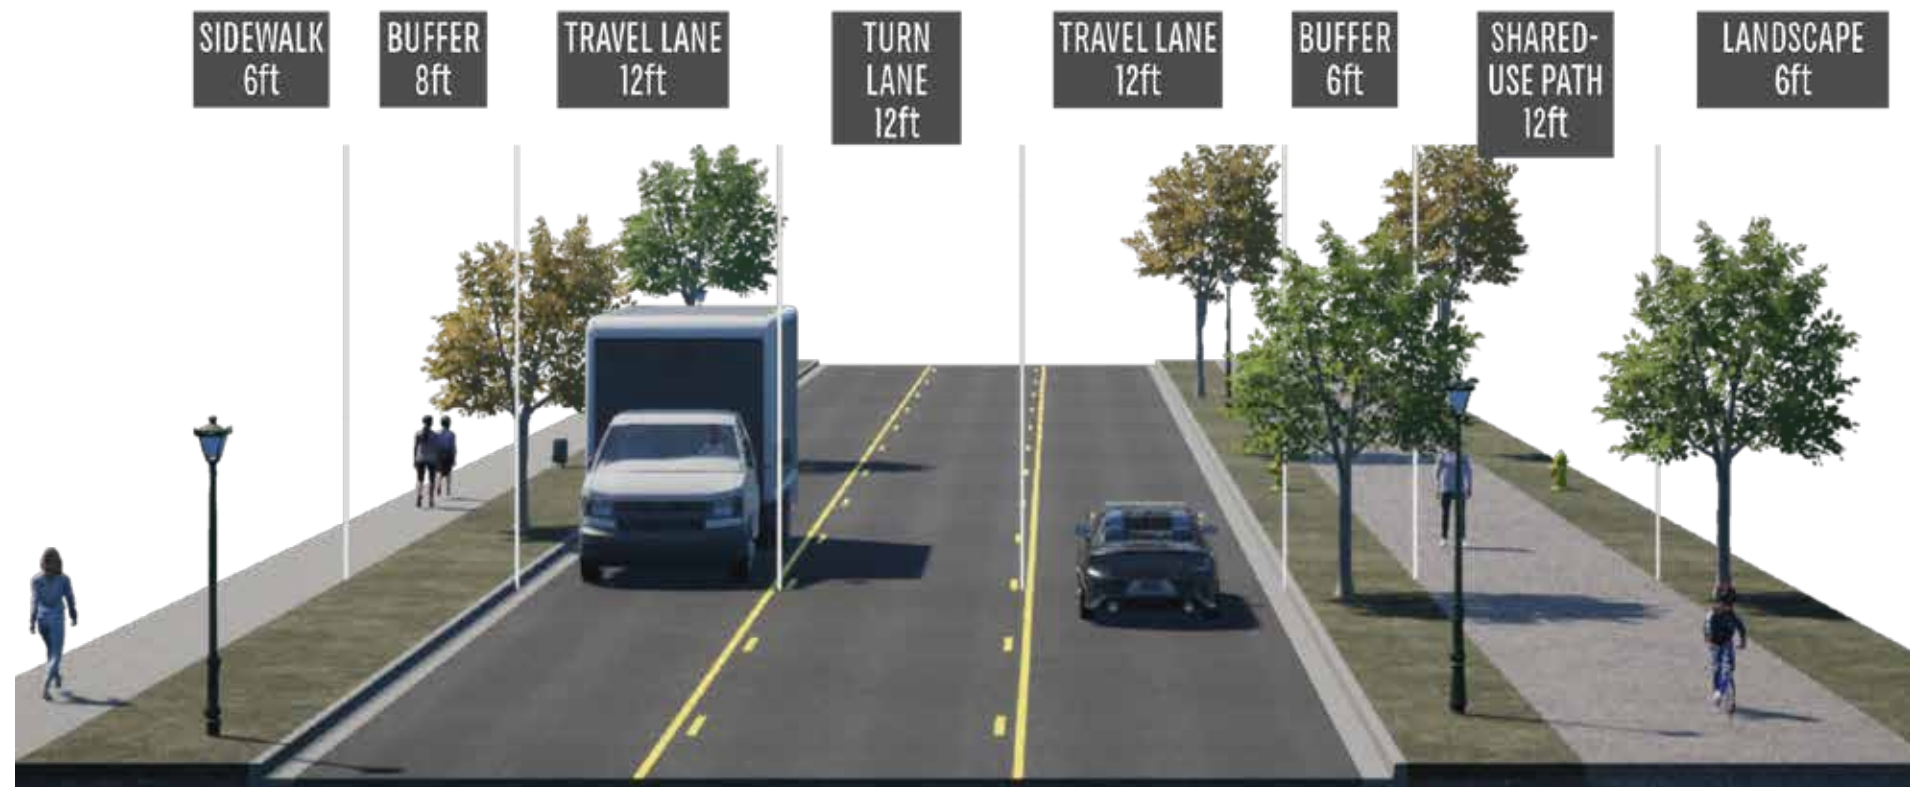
South of TRAX Station- 700 E Proposed Street Section, looking north
